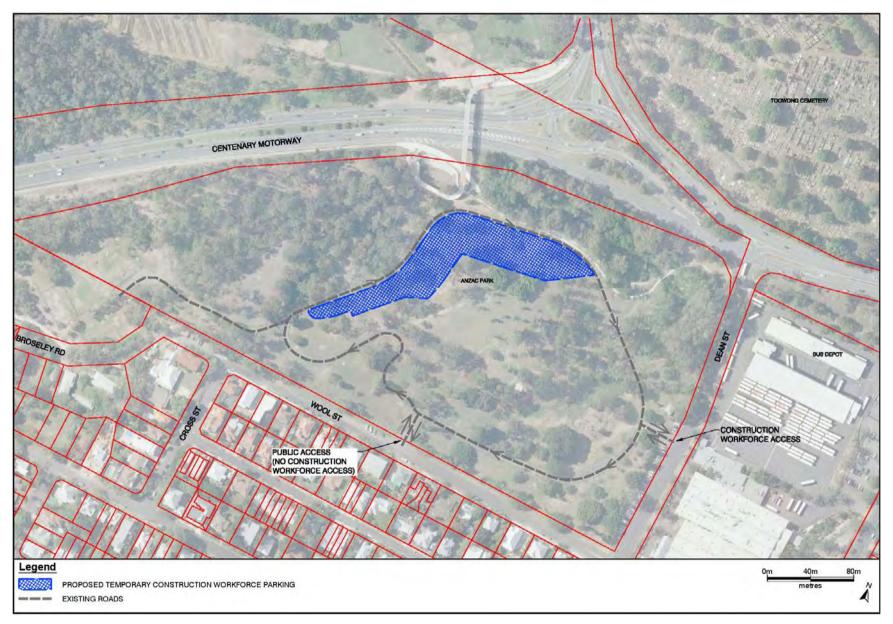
Proposed temporary workforce construction parking – Anzac Park
